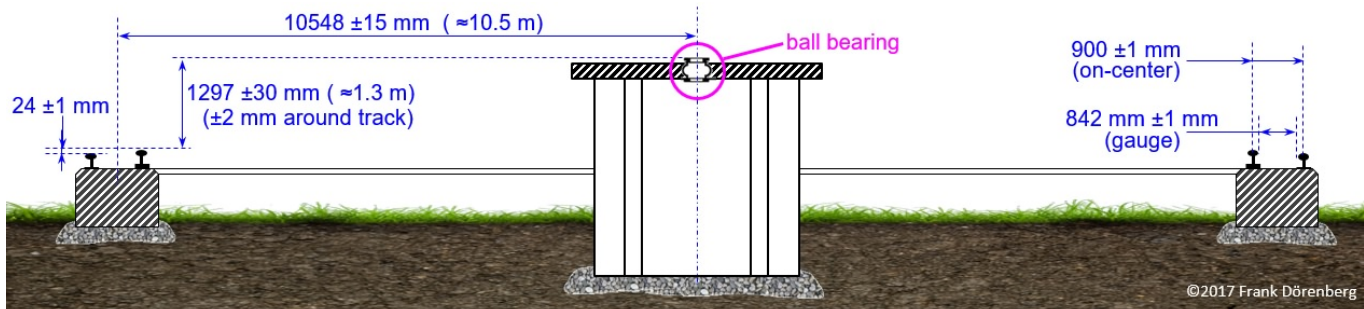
cross section with nominal dimensions and tolerances
